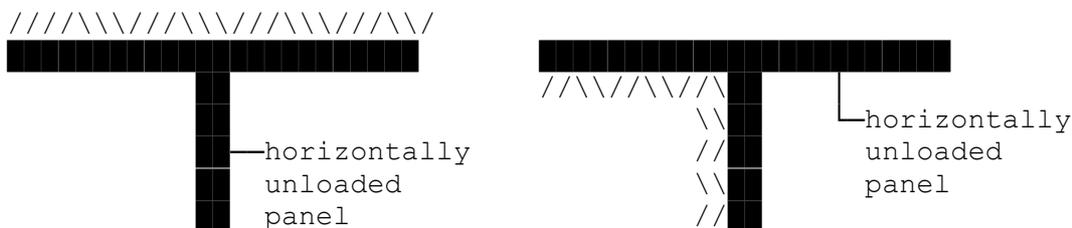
TYPICAL PLANS ON HORIZONTALLY UNLOADED PANELS
